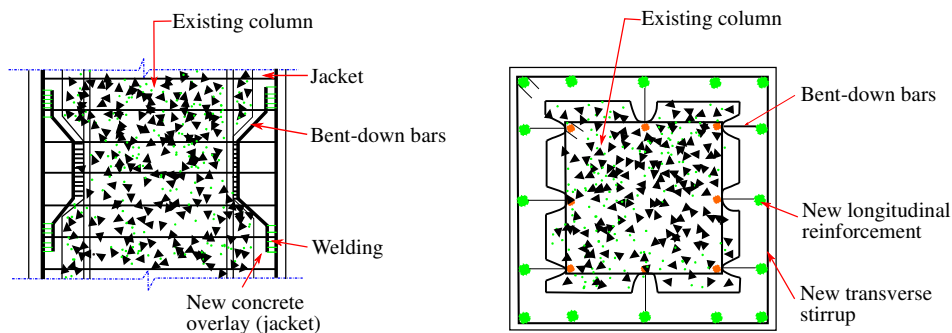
Schematic layout of reinforced concrete jacketing as per IS 15988: 2013 [135]
